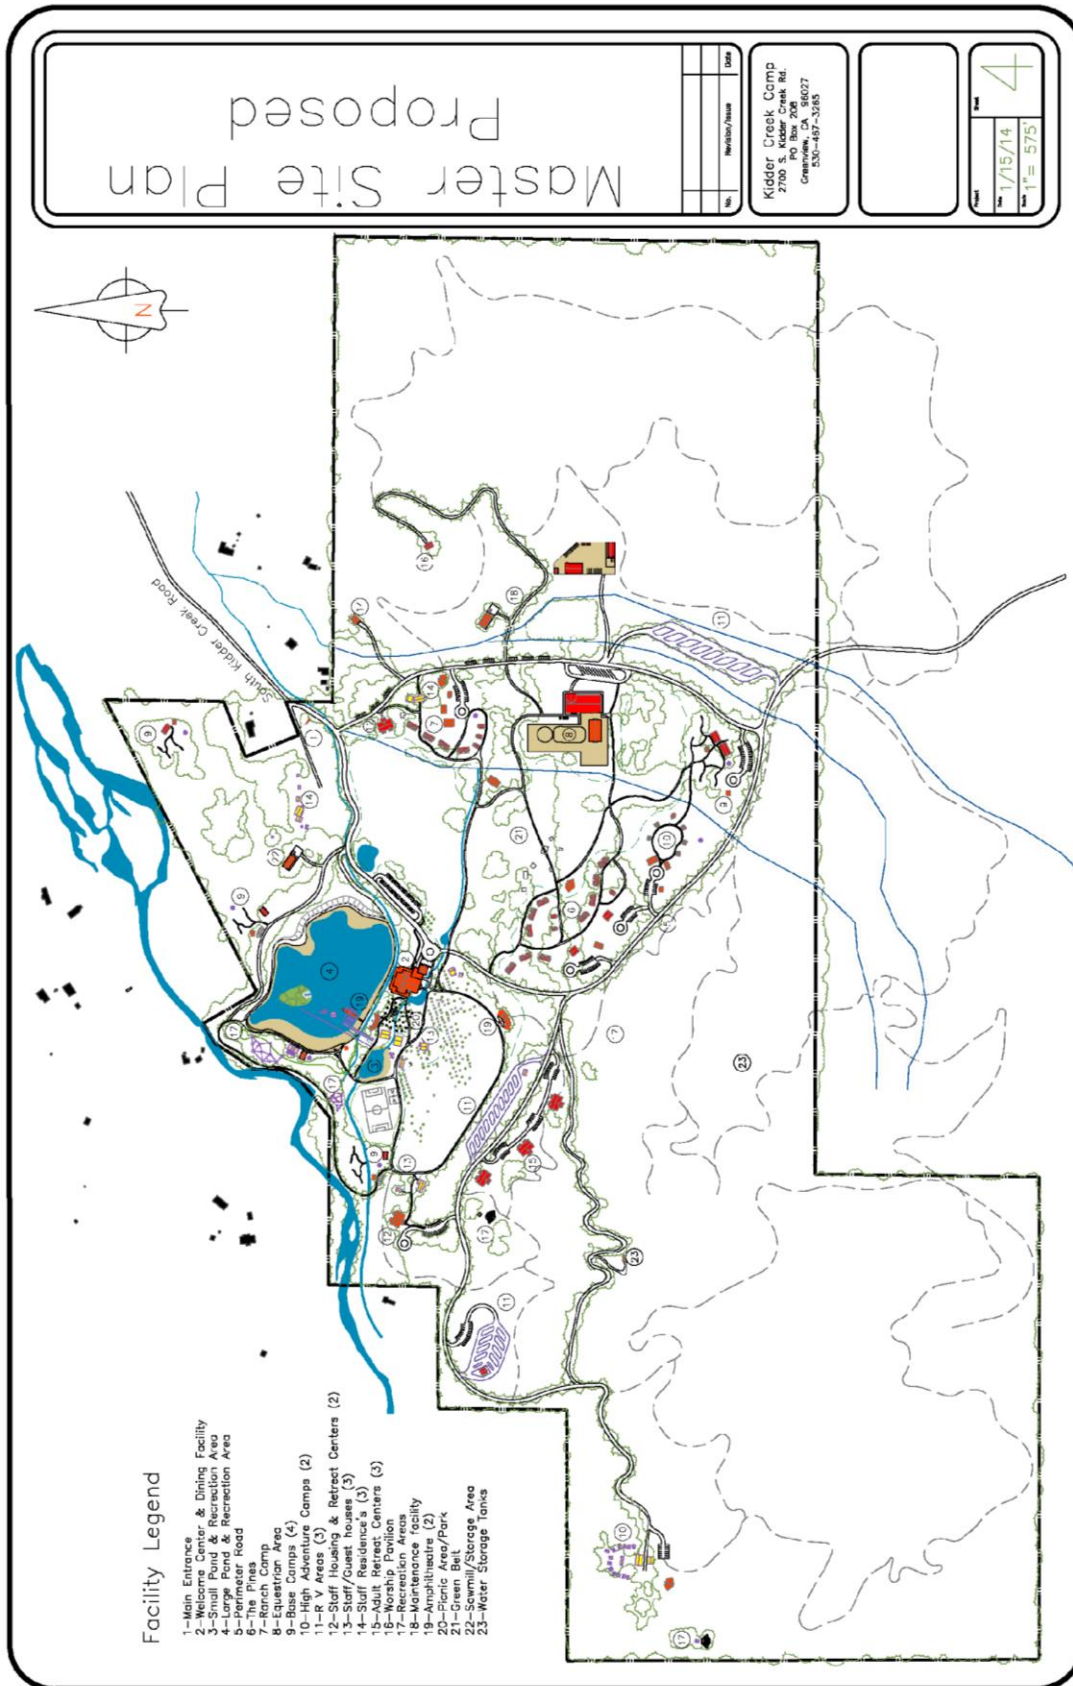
, Proposed Master Site Plan Map (not to scale)
